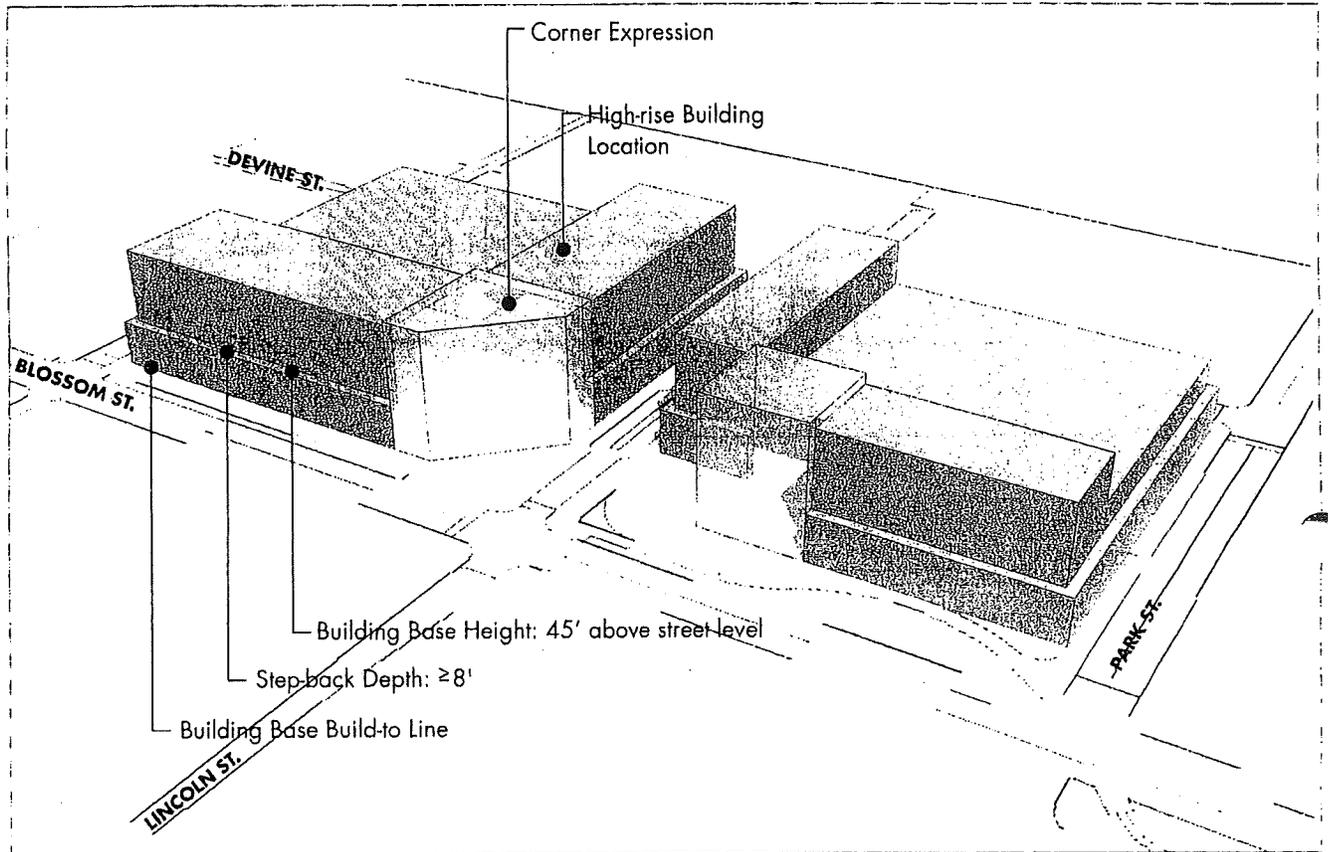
LINCOLN STREET GATEWAY BUILDING ENVELOPE
